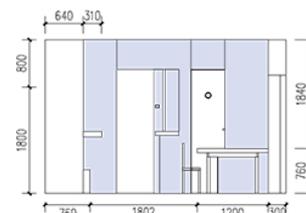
Modified Elevation of the Adjacent Transition Space (Master En-Suite Bathroom) (Source: Self-drawn)
